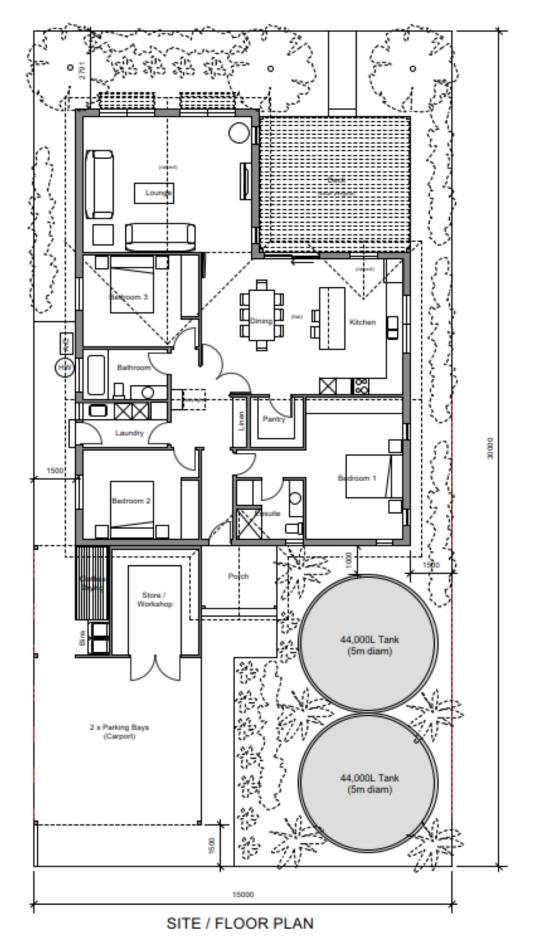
Floor plans of the Cottage Lot Passive Solar House (Thierfelder 2019)
